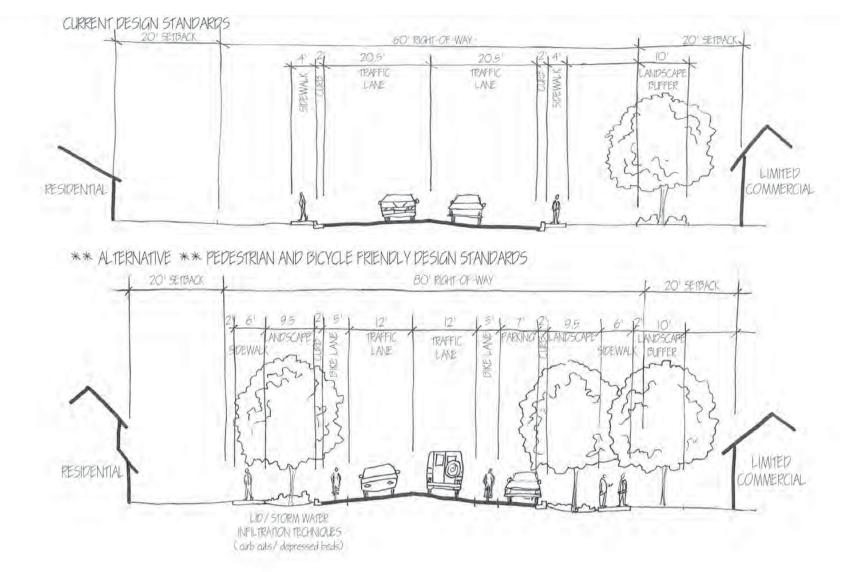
shows two typical street sections: current design standards are illustrated at the top, with a pedestrian and bicycle-friendly alternative shown below. In the alternative section, pedestrian sidewalks are separated from the travel way by landscaping. Also, the alternative provides dedicated bike paths adjacent to the street, in both travel directions. Landscaping buffers between the sidewalks and roadway provide physical and visual seperation for pedestrians, but also a location for potential stormwater treatment. The alternative also provides on-street parking, which the City could consider when evaluating new street design standards to incorporate into the Standard Construction Specifications.
